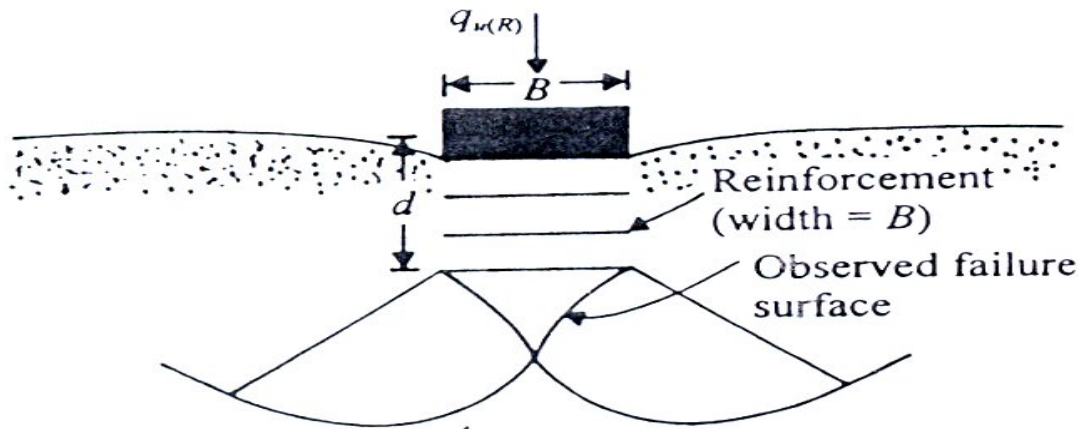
Deep footing failure mechanism in reinforced sand supporting a strip foundation (Huang and Tatsuoka, 1998)
